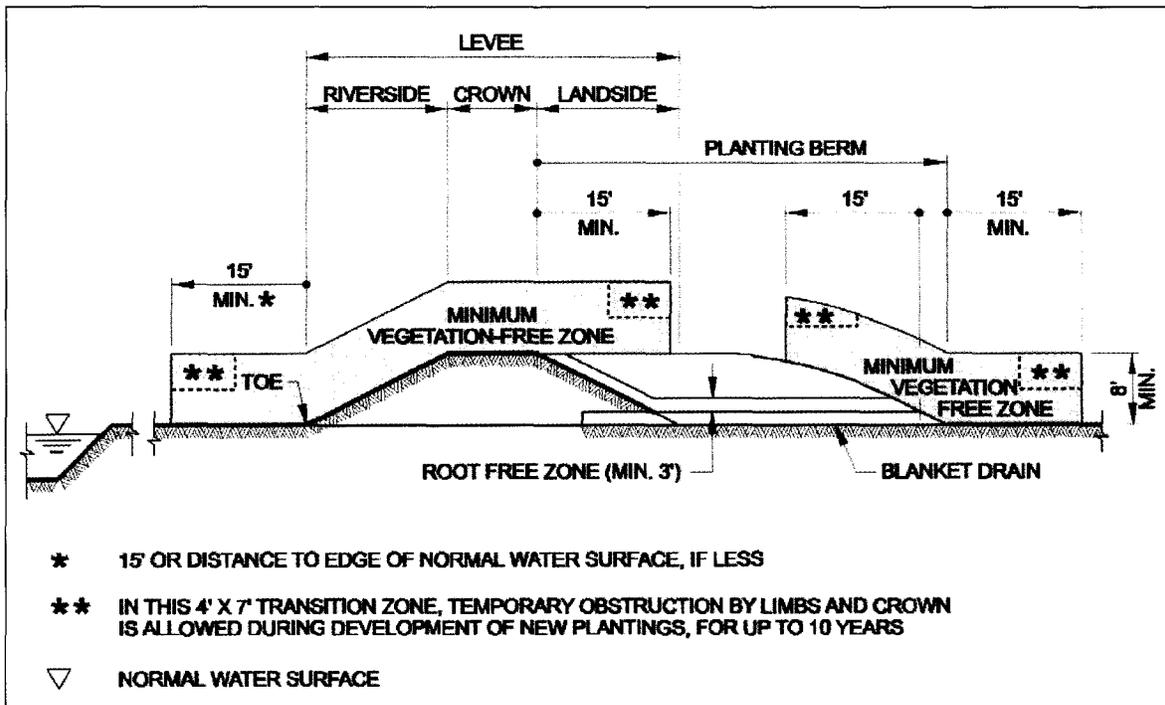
Levee Section with Planting Berm and Blanket Drain.
